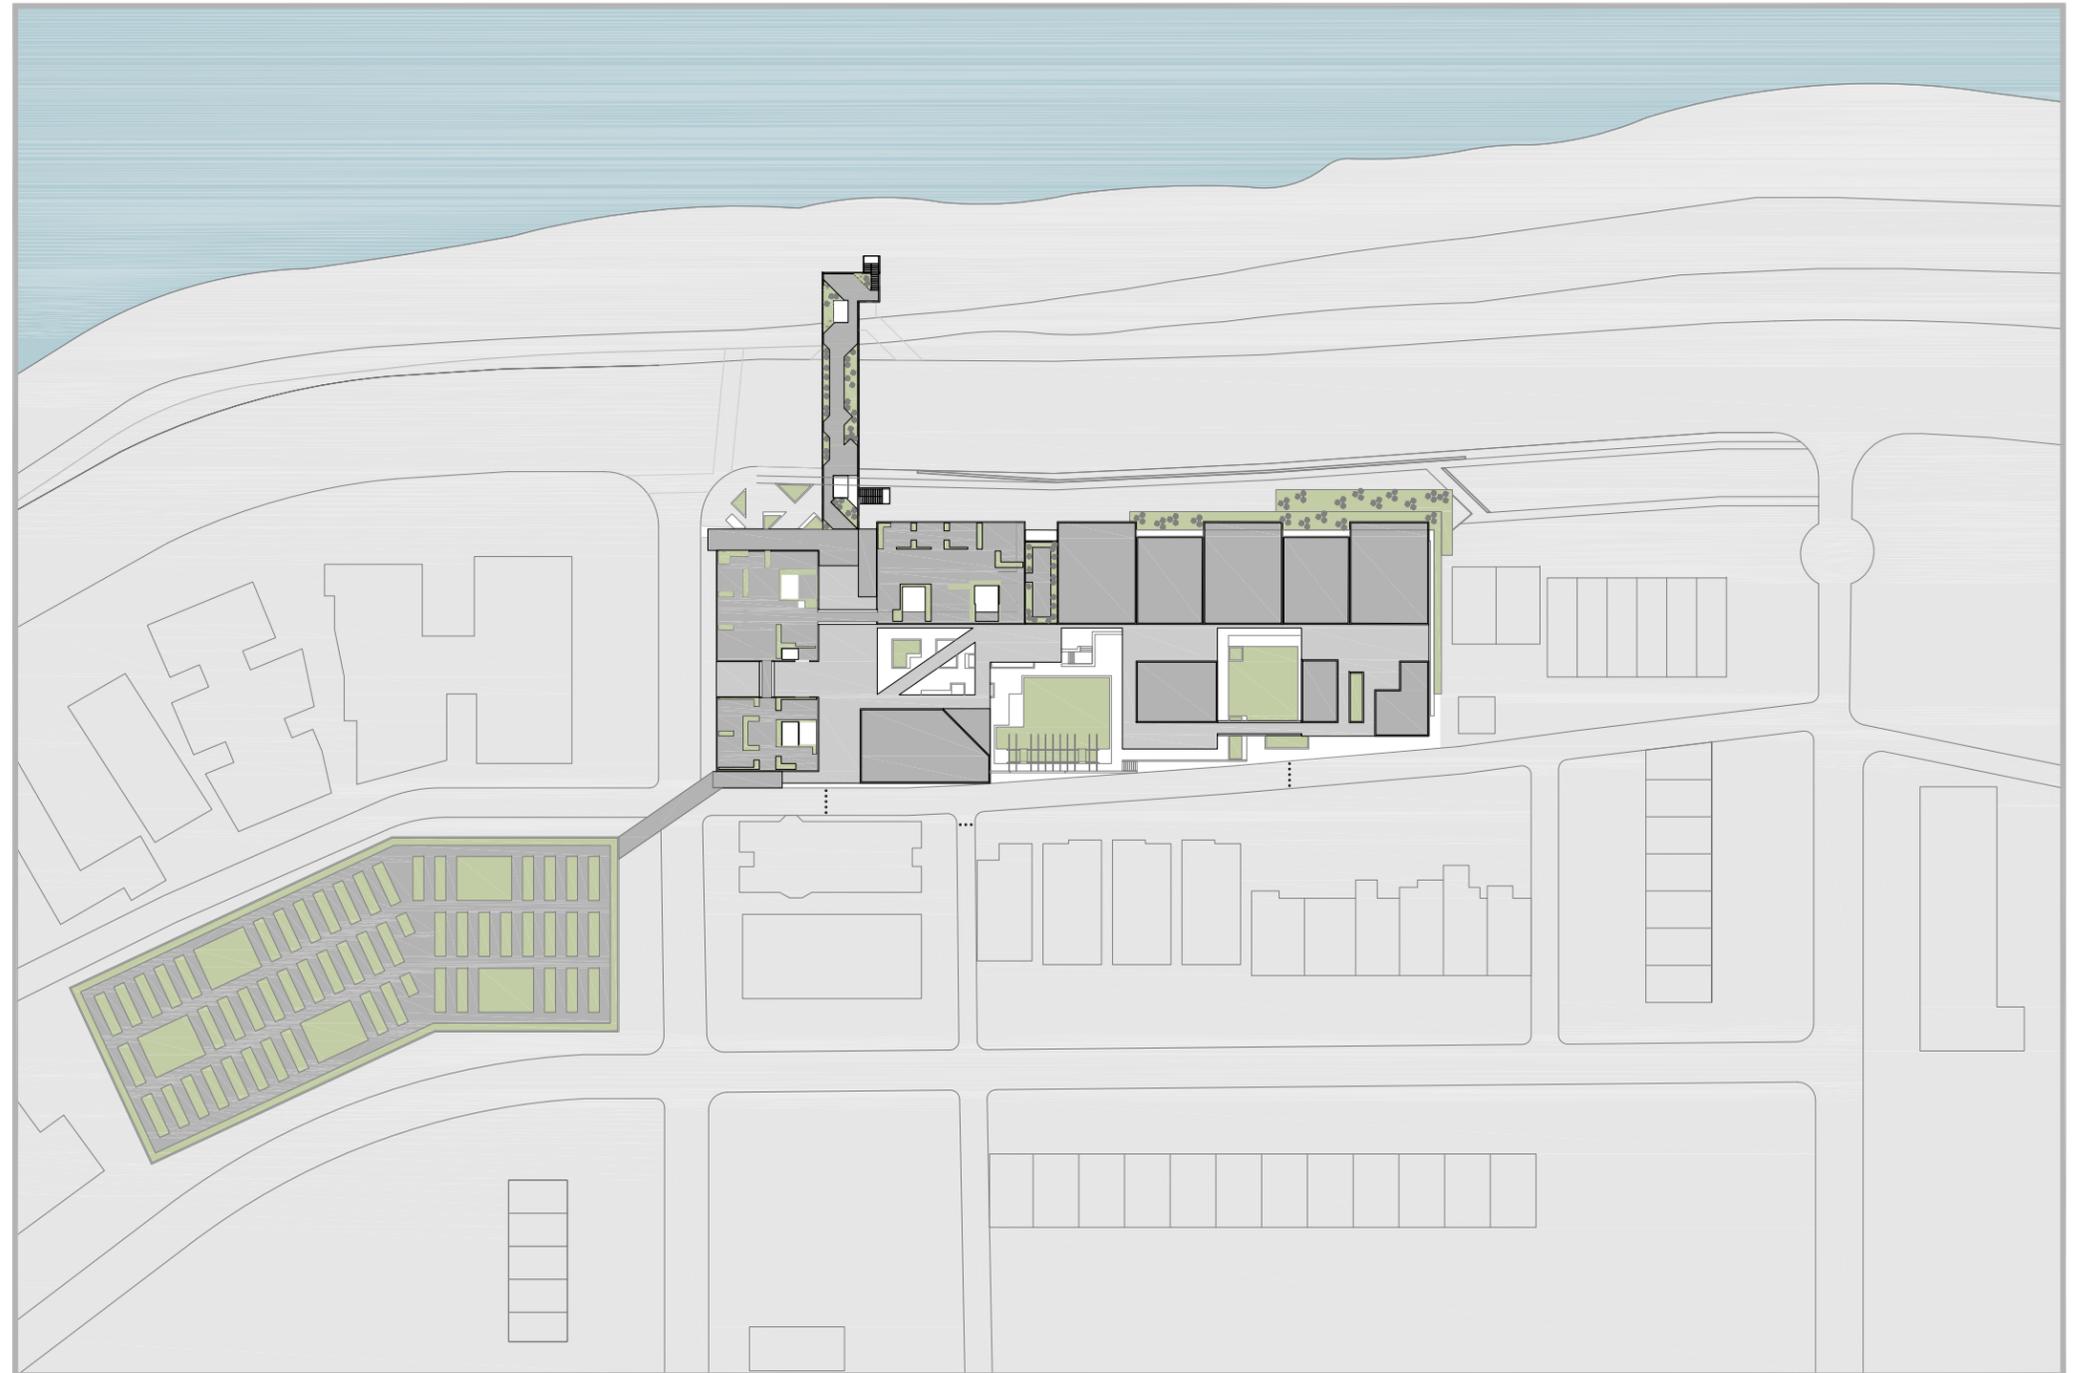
PARTIAL PLAN OF BALTIMORE'S RESERVOIR HILL NEIGHBORHOOD WITH X.X ACRE SITE
